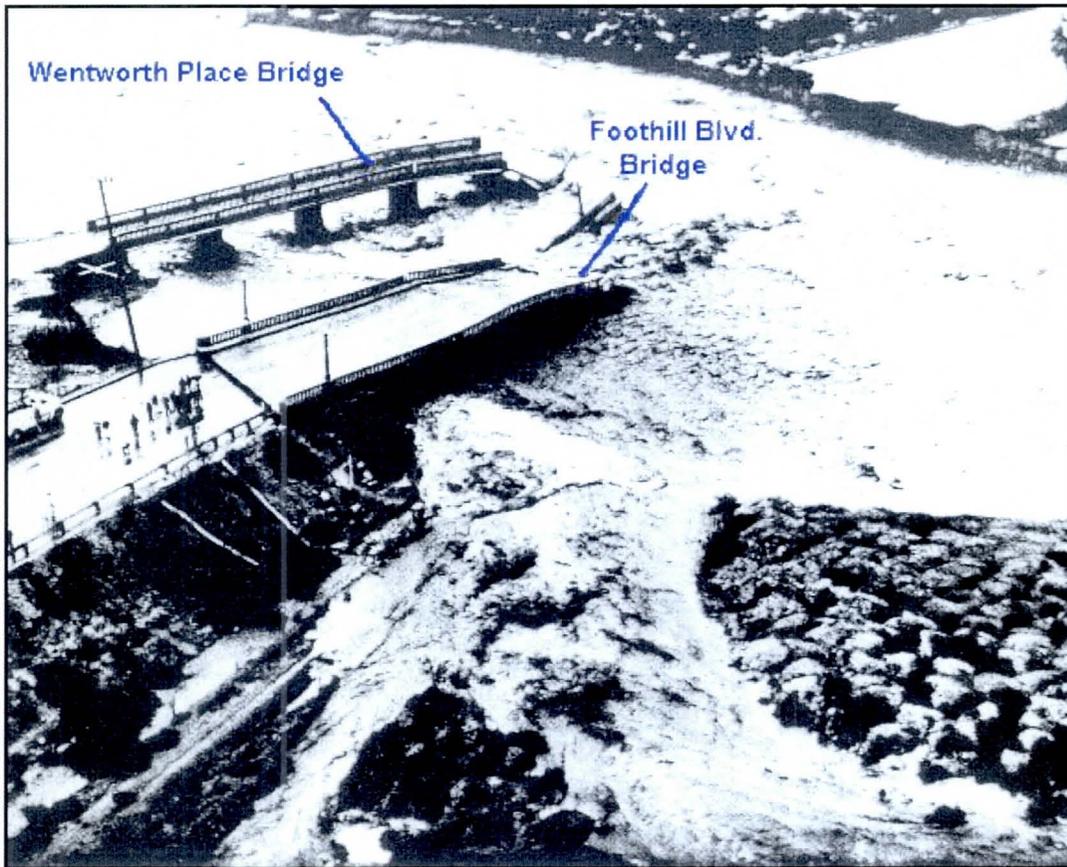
Picture by Harold Morby looking downstream (NW) at Foothill Blvd. and Wentworth Place bridge failures (from Scott, 1973).
